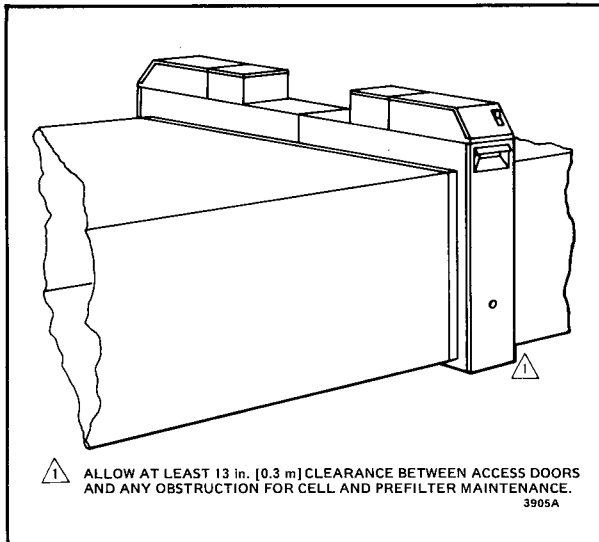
HORIZONTAL FURNACE. AIR CLEANER IS MOUNTED HORIZONTALLY ABOVE CEILING. UNLESS AIR CLEANER IS EASILY ACCESSIBLE FROM ATTIC, CONSIDER USING F52 CEILING MOUNT AIR CLEANER INSTEAD.
